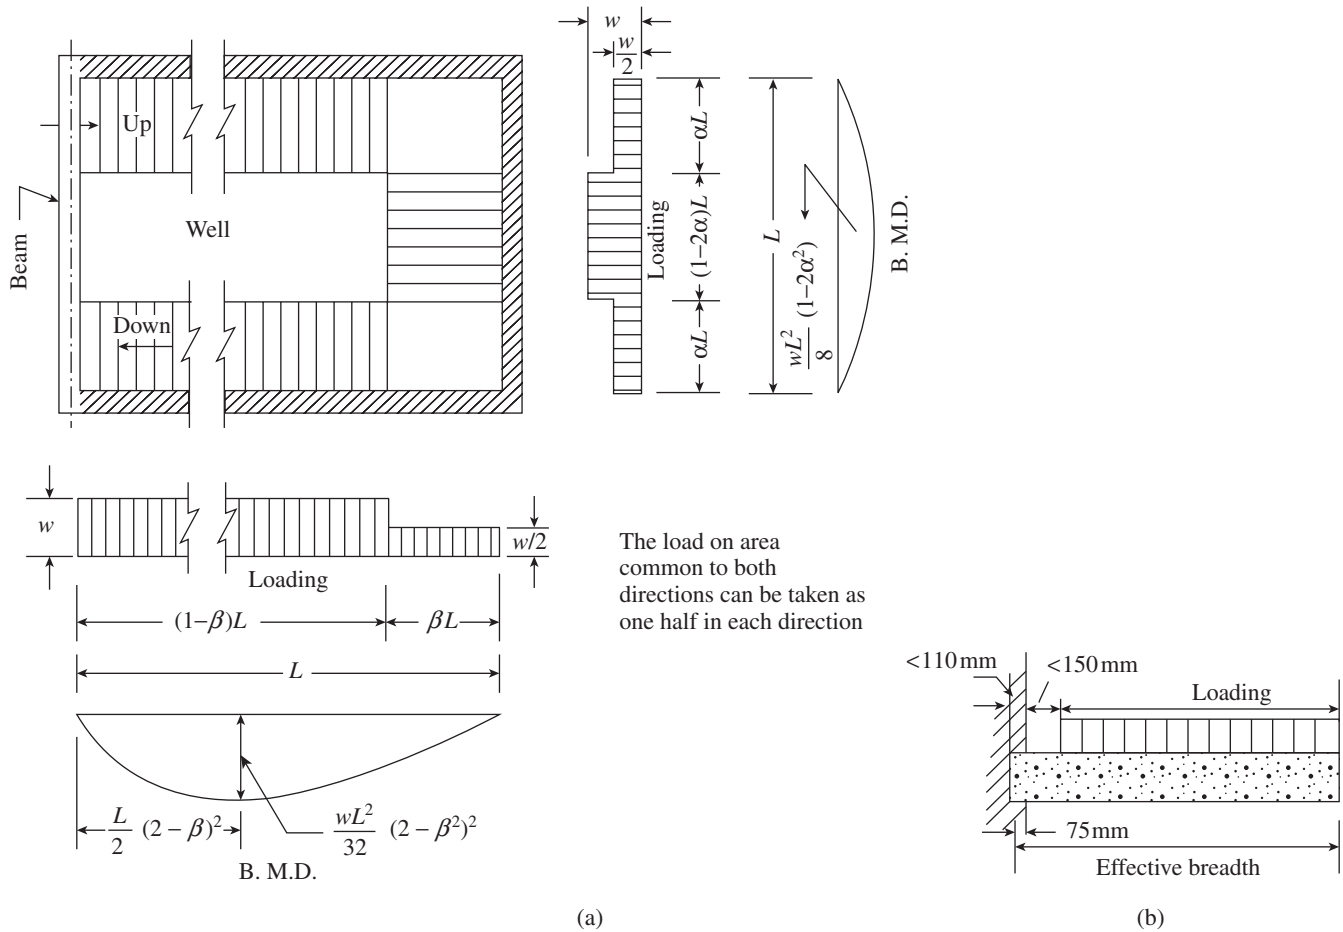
Distribution of loading on stairs (a) Open well stairs (b) Stairs built into the walls
